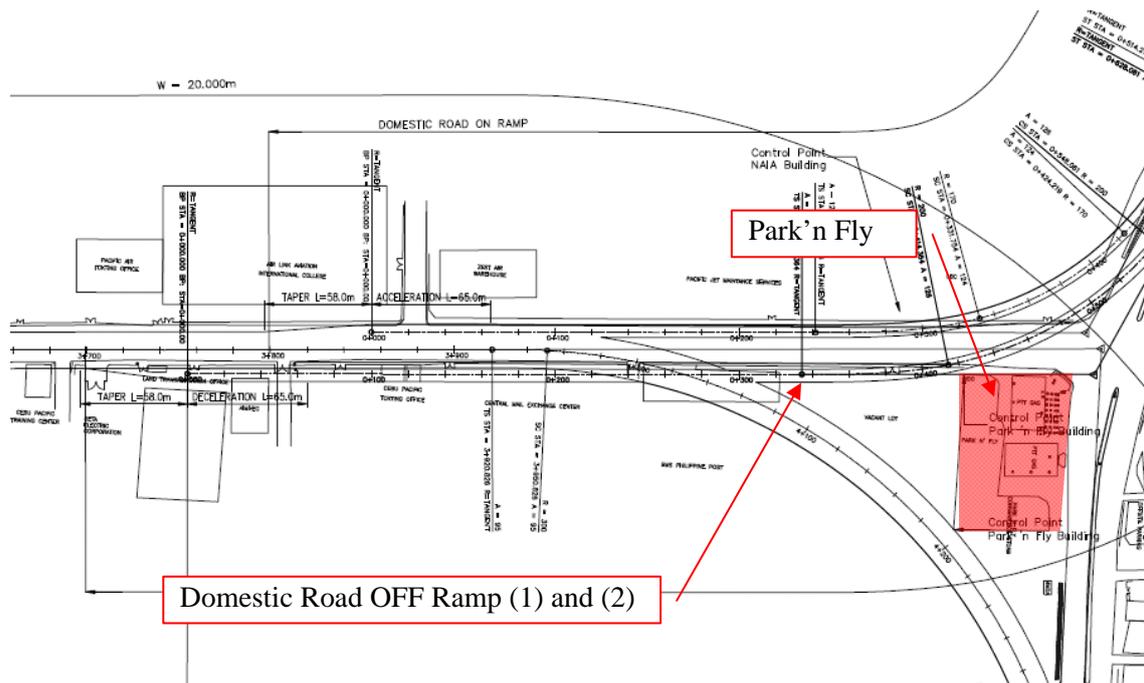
DOMESTIC ROAD OFF RAMP (1) AND (2)
